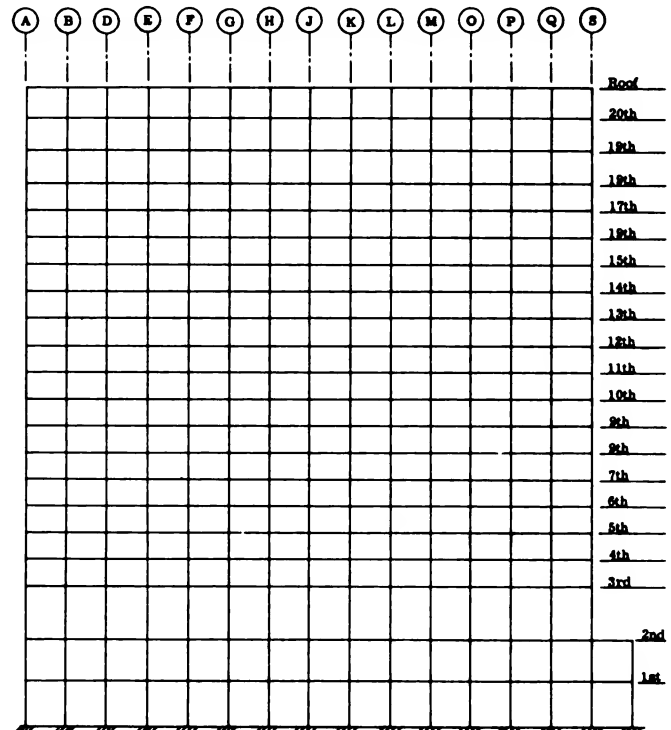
Sheraton-Universal Hotel. Typical east-west frame.
